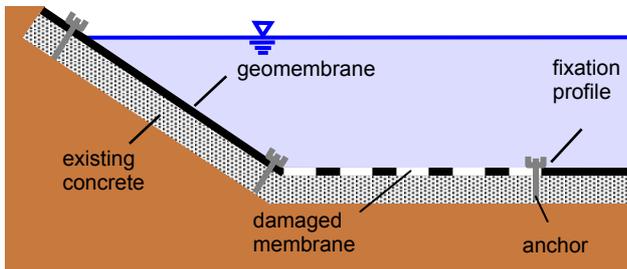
Example of Damage of geomembrane in bottom area between two fixation profiles
